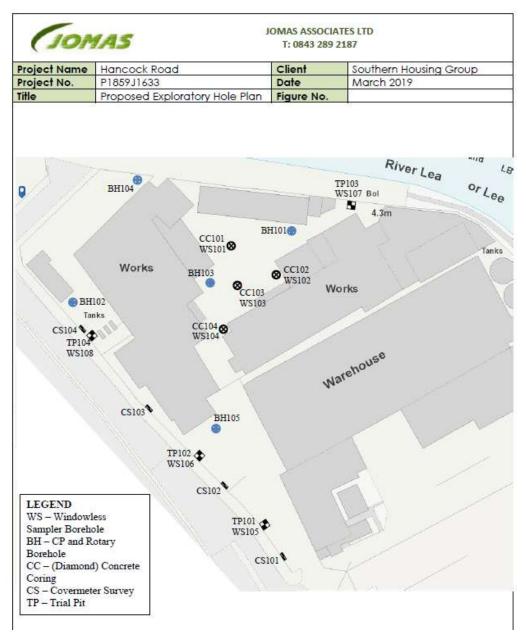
Plan showing the locations of boreholes and test pits undertaken. Drawing supplied by The Client (P1859J1633).
